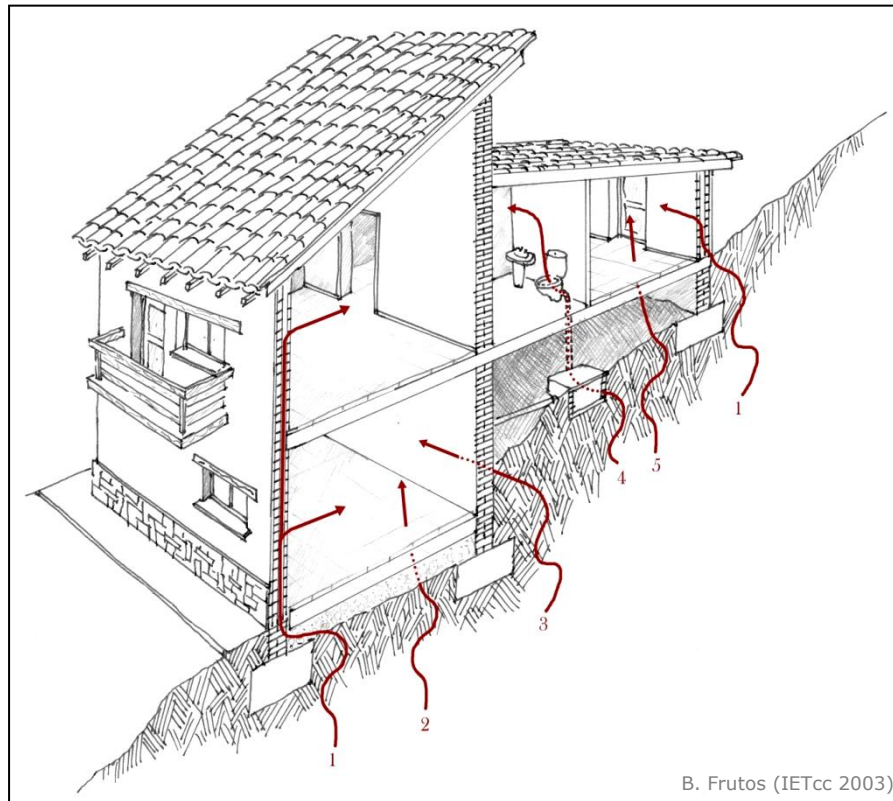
Common ways of radon entry into buildings. (1-Cavity walls, 2 - Through the floor slab, 3 - Through the basement walls, 4 - Through sanitation pipes, 5 - Through the floor slab)
